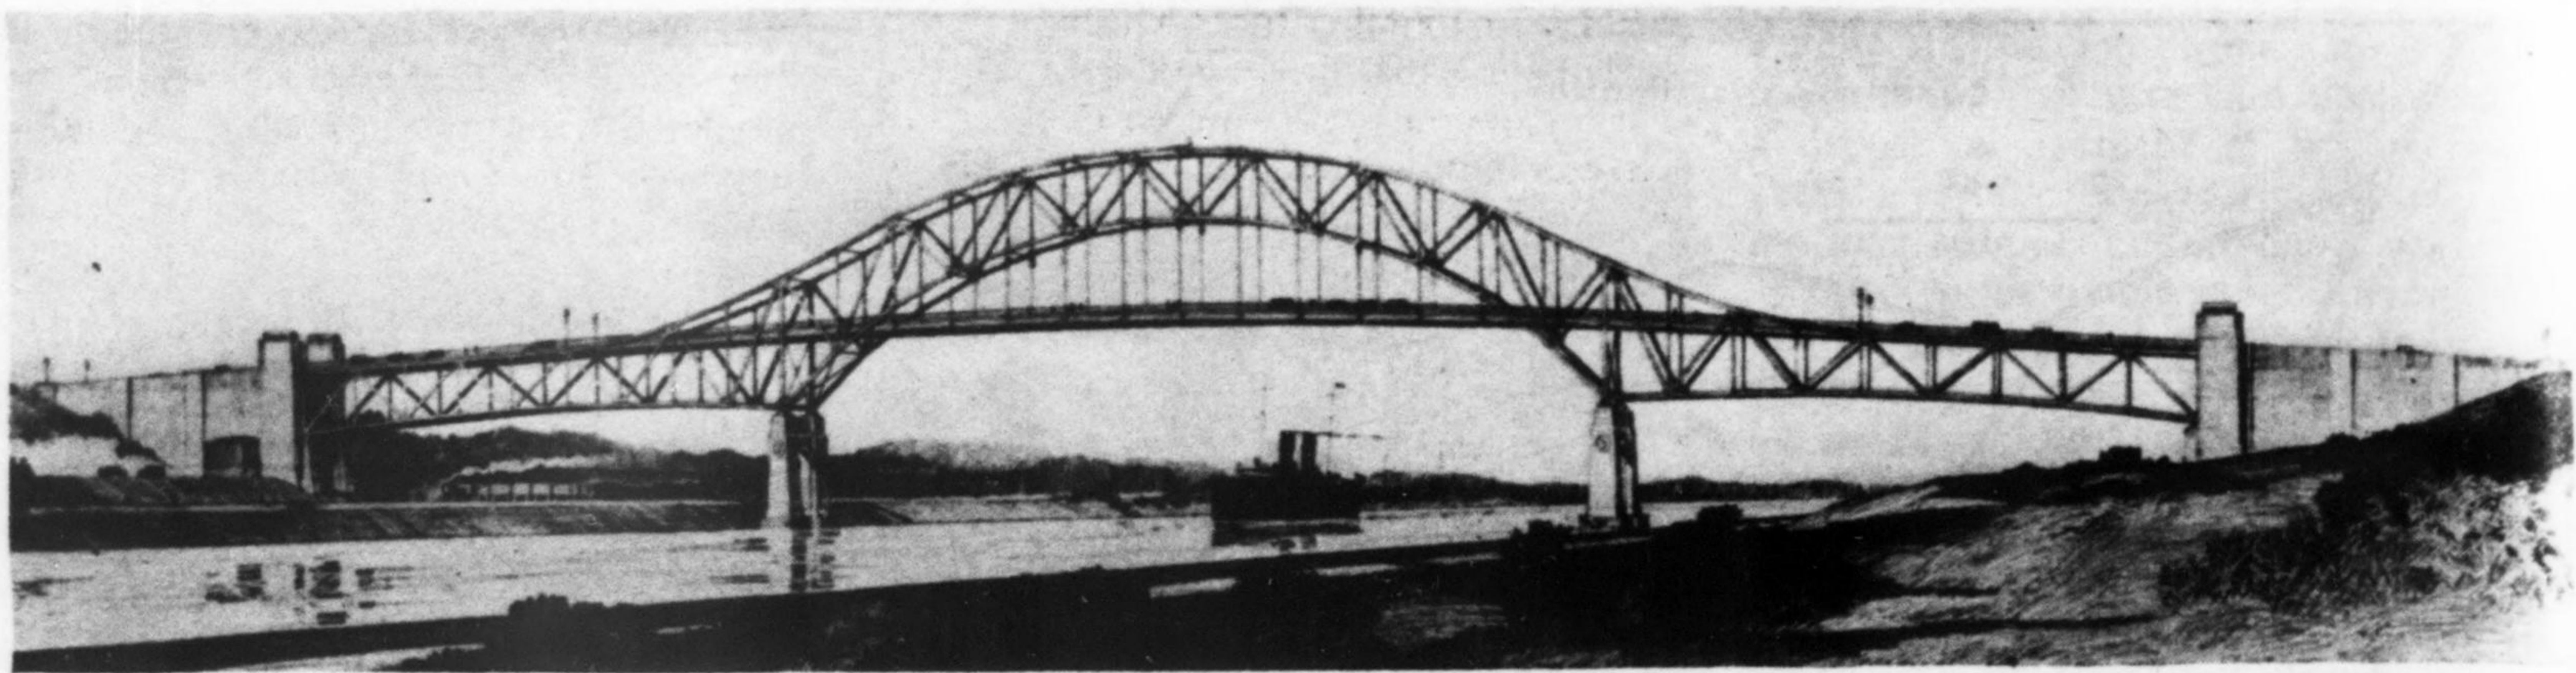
ARTIST'S DRAWING of one of the two new highway bridges that will span Cape Cod Canal. This is the Sagamore Bridge; the Bourne structure is identical except for the addition of side spans. The main crossing is a three-span continuous truss with a center span of 616 ft. and flanking spans of 396 ft.
